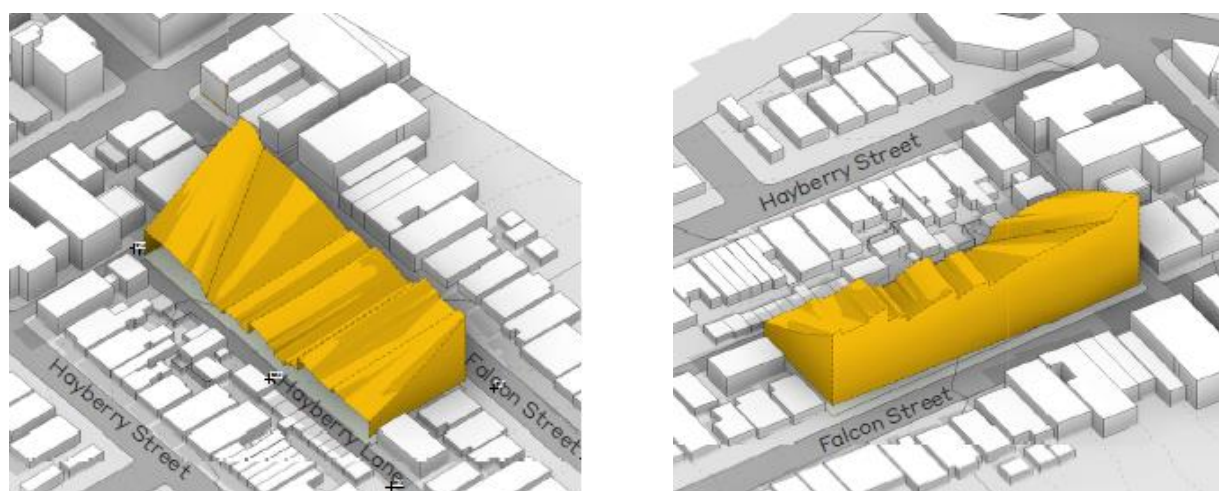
Solar envelope plane looking north (left image) and south (right image)
